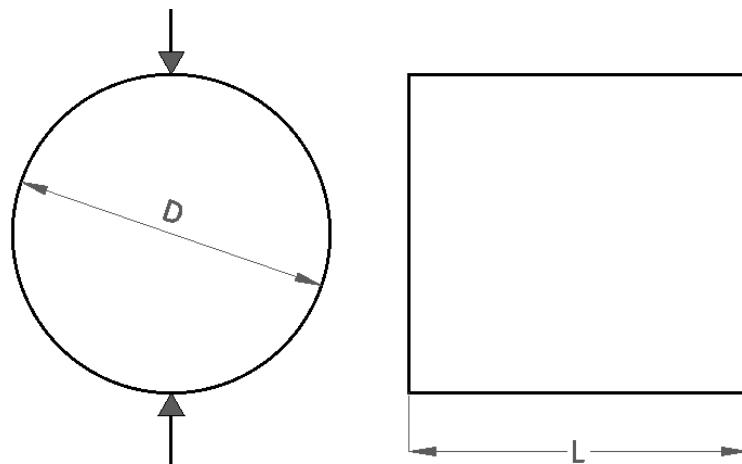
Splitting strength, typical cylindrical specimen in diametral compression
